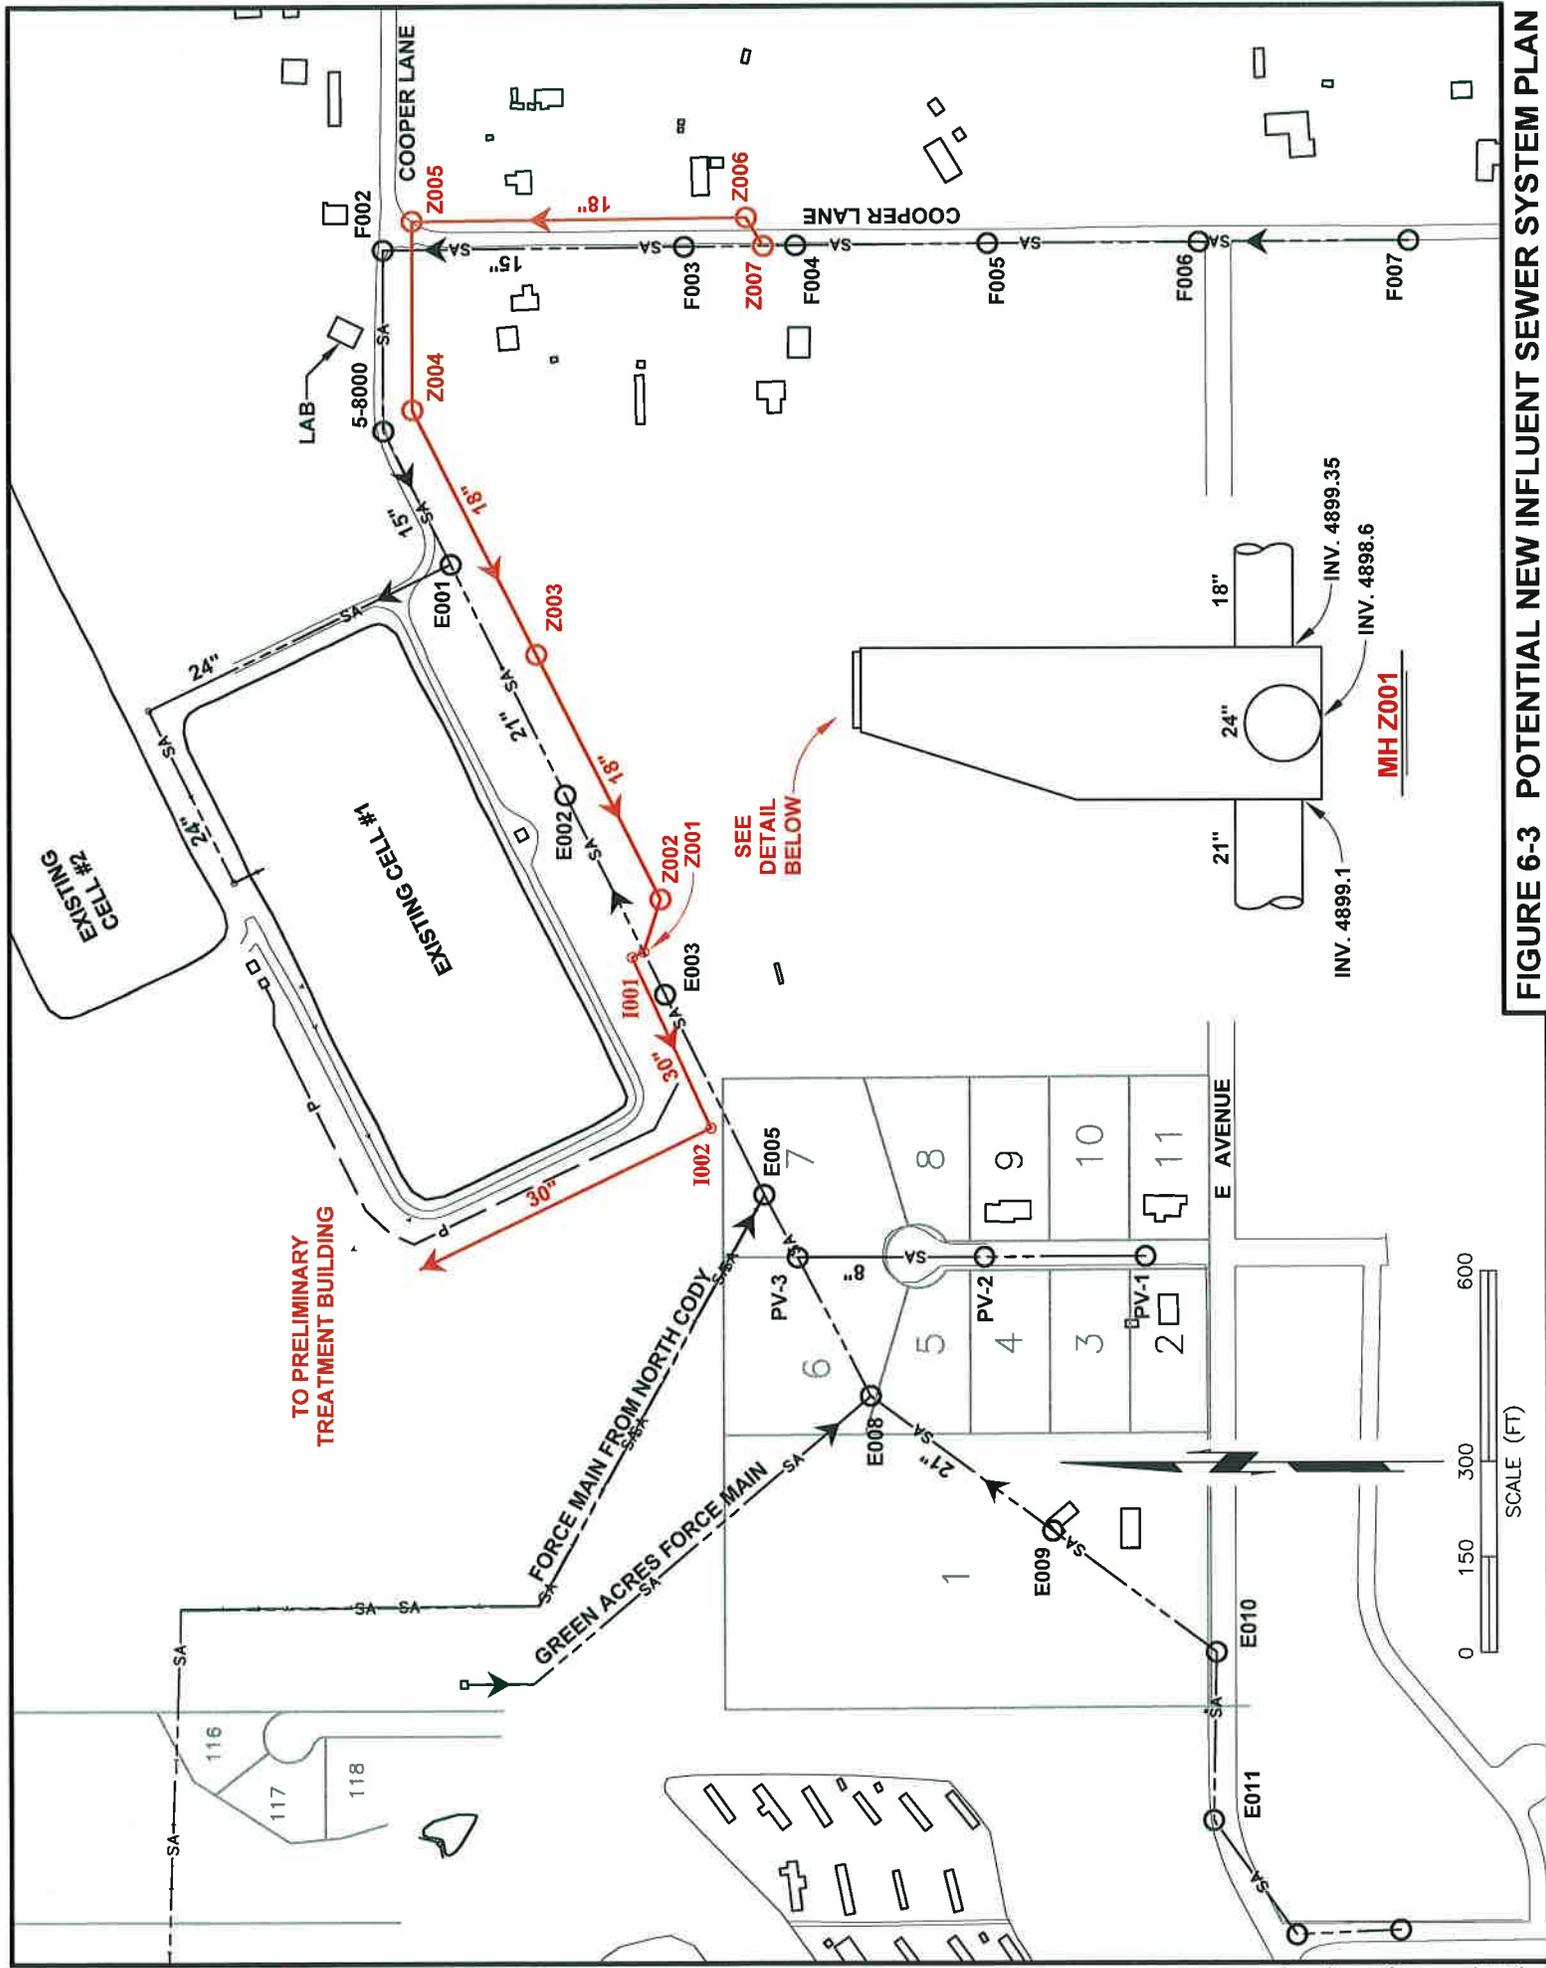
POTENTIAL NEW INFLUENT SEWER SYSTEM PLAN
